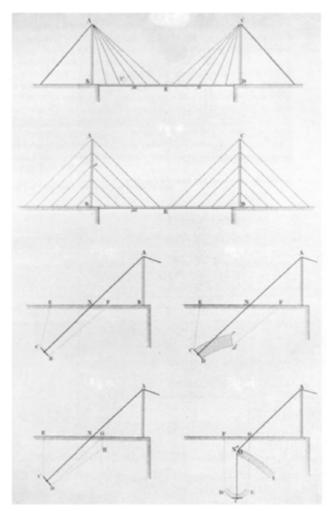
Static schema of cable-stayed bridge developed by Navier, 1823 [1-3]
